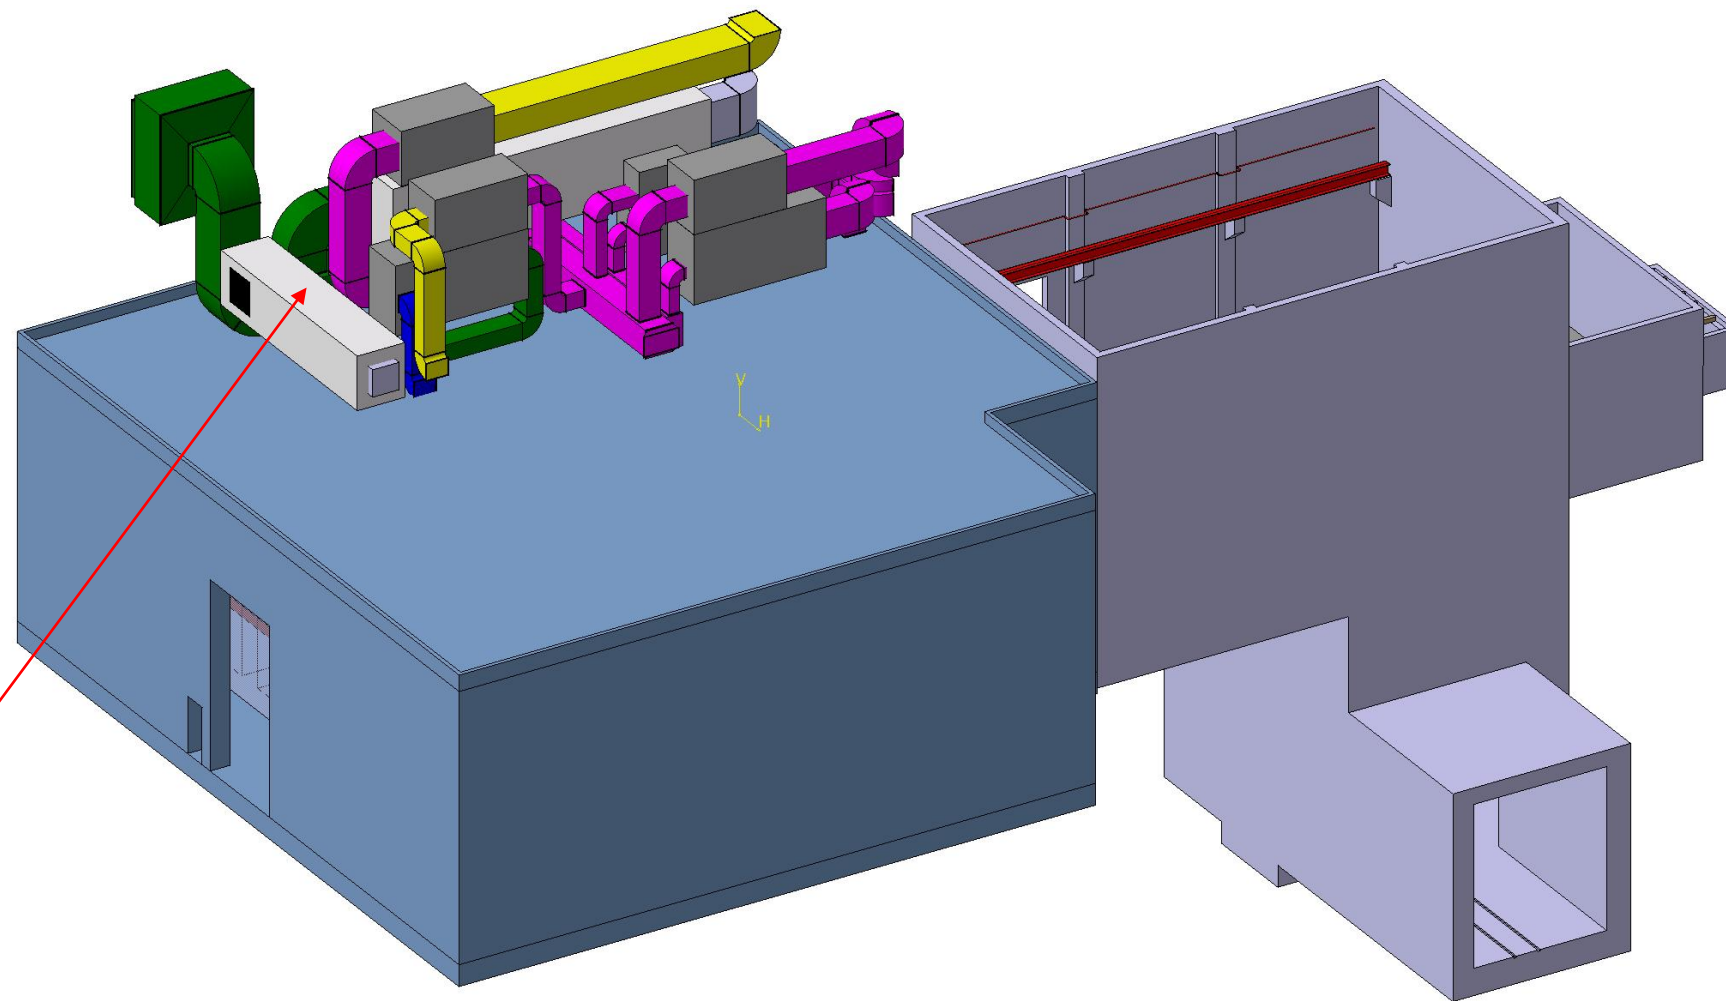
Layout of ventilation units in a dedicated area of the auxiliary building, including all ventilation units for the target complex, the auxiliary building, and the extraction tunnel.
